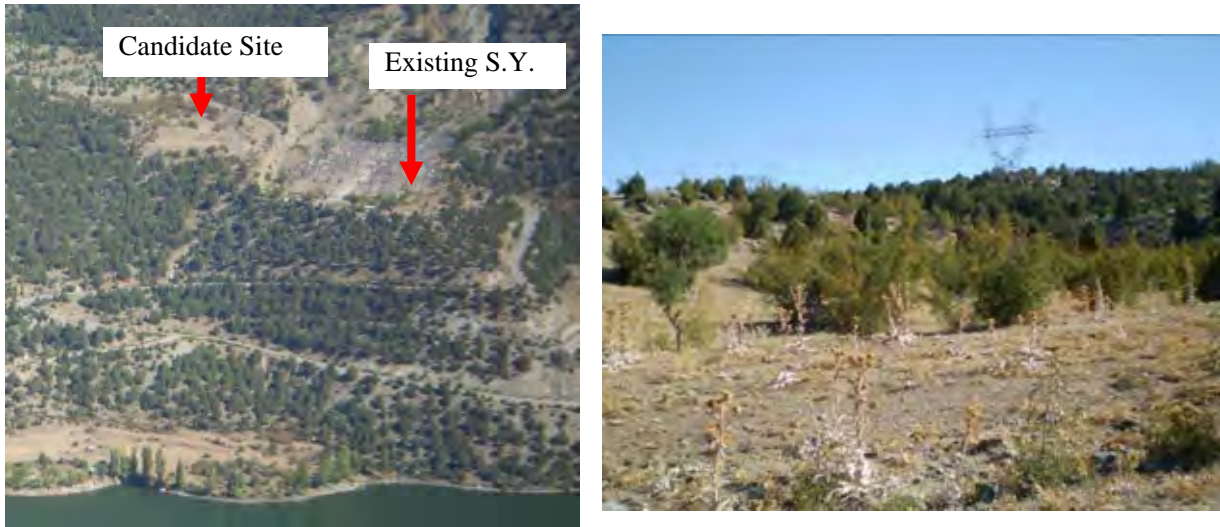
Candidate Site for Transmission Tower for Connecting to Existing S.Y.
